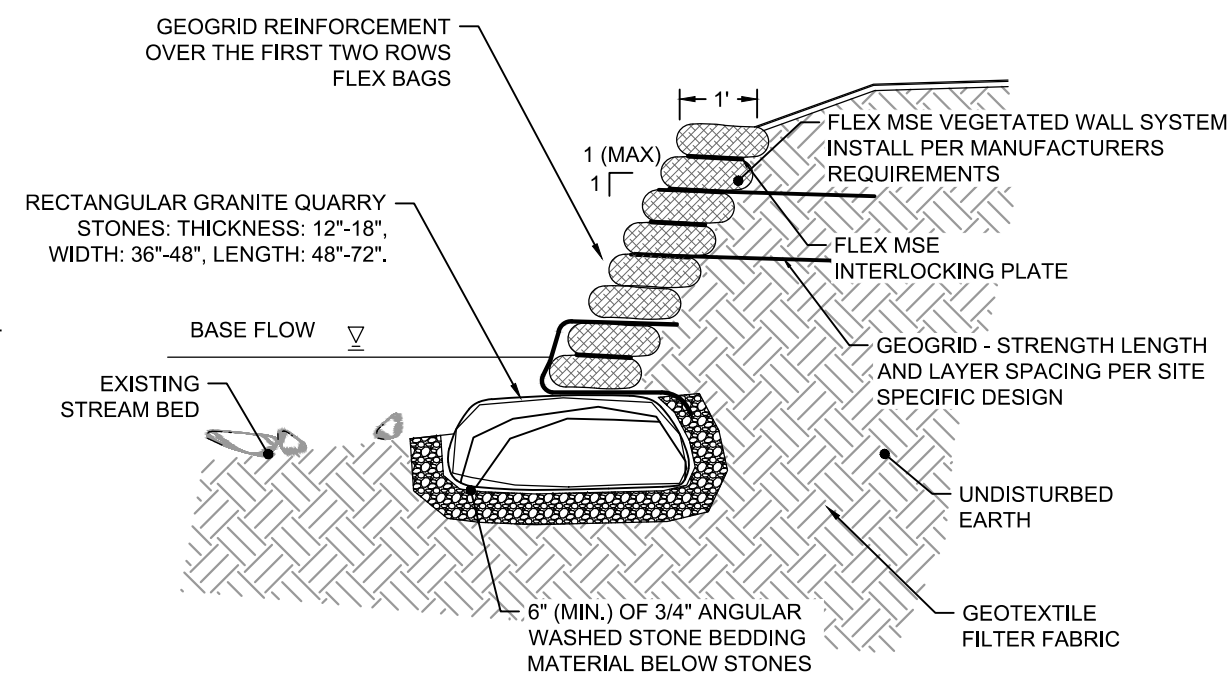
DETAIL PROVIDED BY ADVANCED DRAINAGE SYSTEMS, INC.
